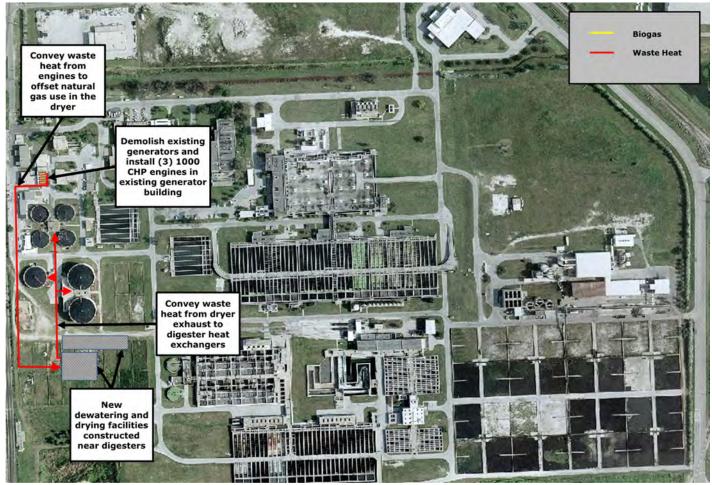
Alternative No. 4 Conceptual Level Site Plan
